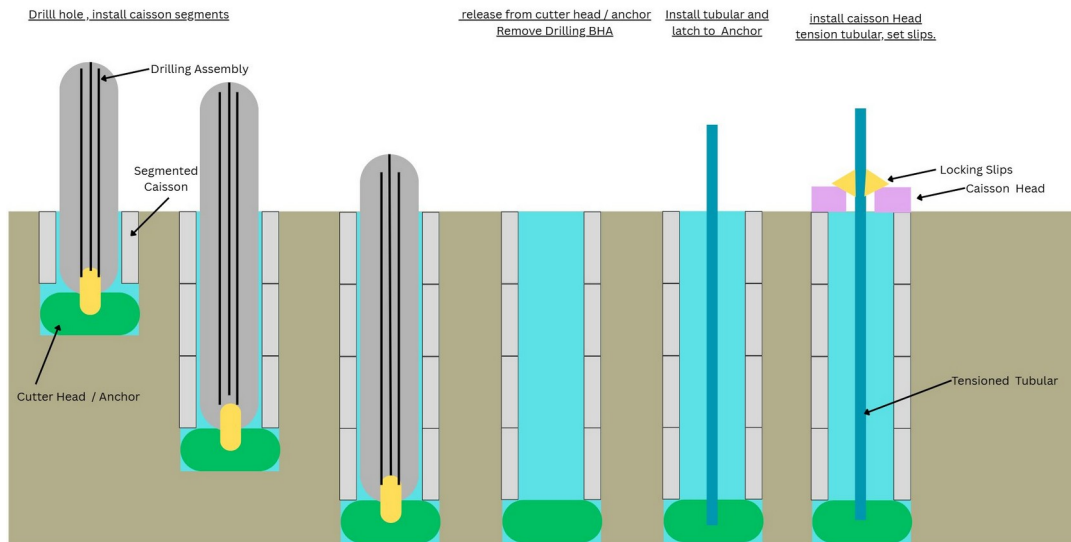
Foundation installation sequence. Left to right: drill hole and install caisson segments behind the cutter head; release from cutter head / anchor and remove drilling BHA; install tubular; the anchor fitting on the bottom end latches into the reciprocal profile cast into the buried cutter head; install caisson head, tension tubular, and set locking slips.
